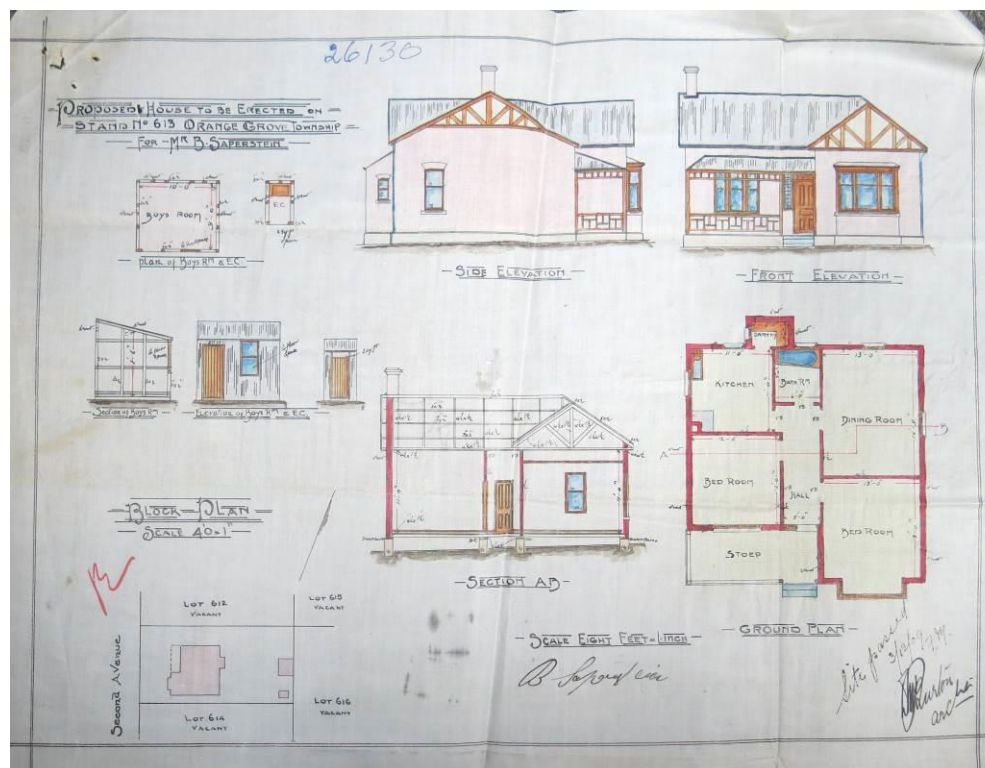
Plan for proposed house to be erected on Stand 613, Orange Grove (Source: City Council of Johannesburg, Plans Archive)
